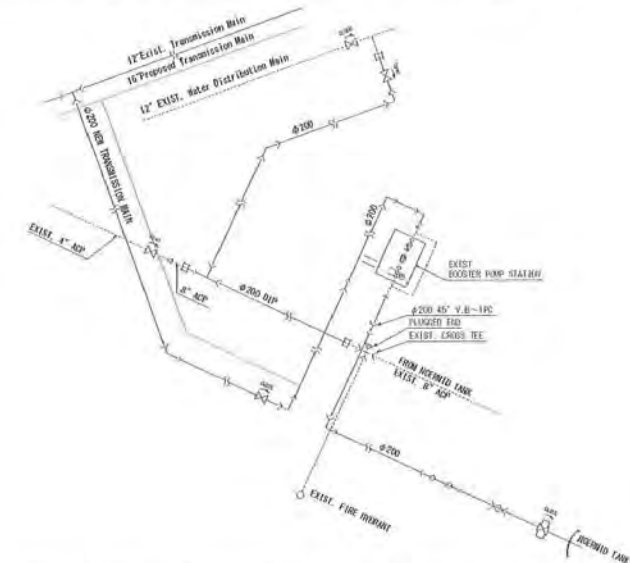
Proposed Connections to Ngermid Service Tank
